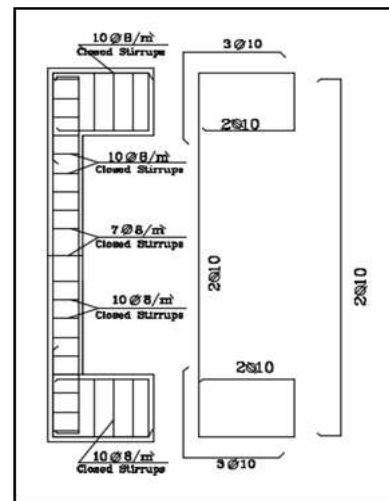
Reinforcement Details for Eccentrically Loaded Columns (NC2, NC3) and (COMC2, COMC3)
